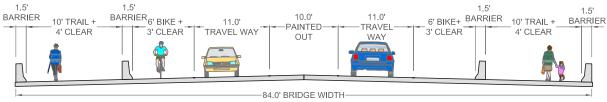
A Series of Typical Sections for Tower Terrace Road
